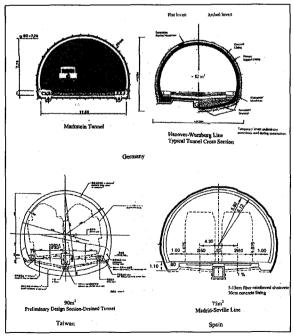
Typical Sections for Double-Track High Speed Rail Tunnels in Germany, Taiwan and Spain
